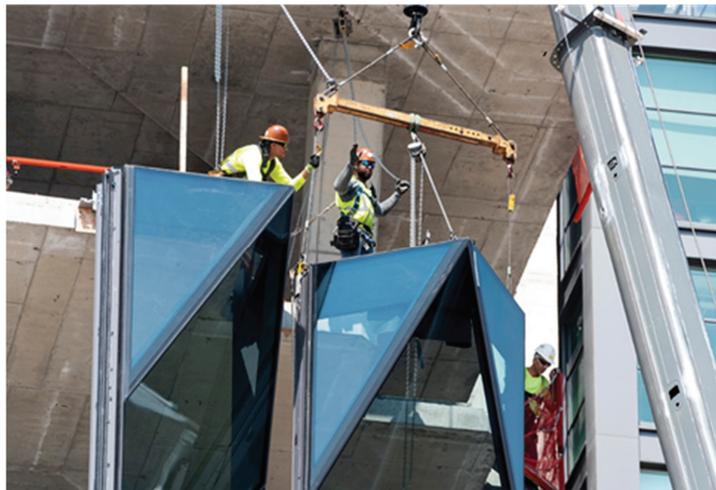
Several workers working at height during the CWM installation process (facade installation in Solar Carve Tower, New York. Facade engineered and manufactured by Focchi Group; photo by Timothy Schenck).
